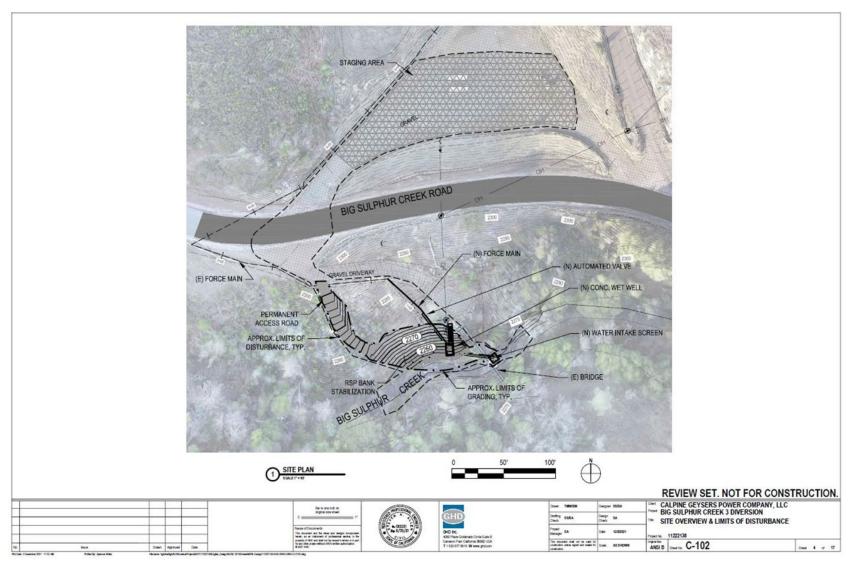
Big Sulphur Creek - III Water Extraction Facility Replacement Project Site Overview
